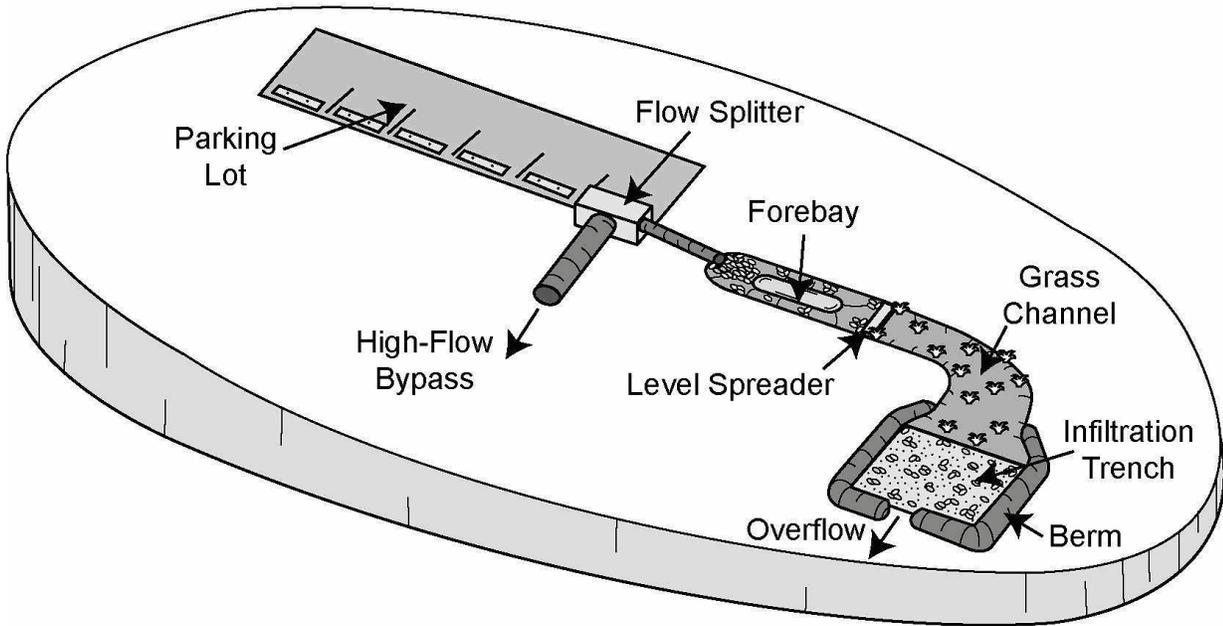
Infiltration Plan and Section (VADCR, 2011)
